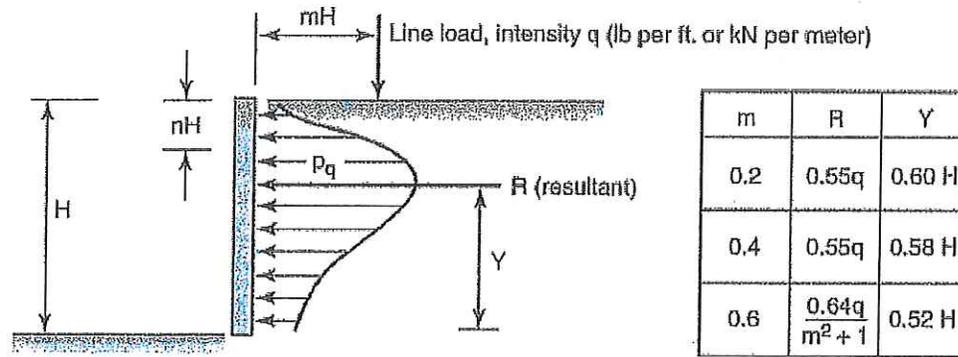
Pressure distribution against vertical wall resulting from line load of intensity q.
